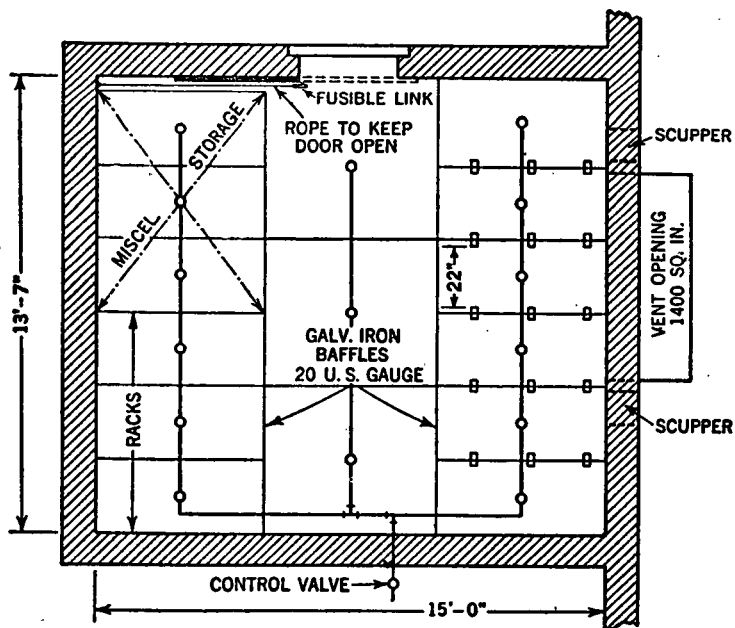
Raw Stock Storage Vault, Showing General Arrangement of Sprinklers, Racks and Baffles.
